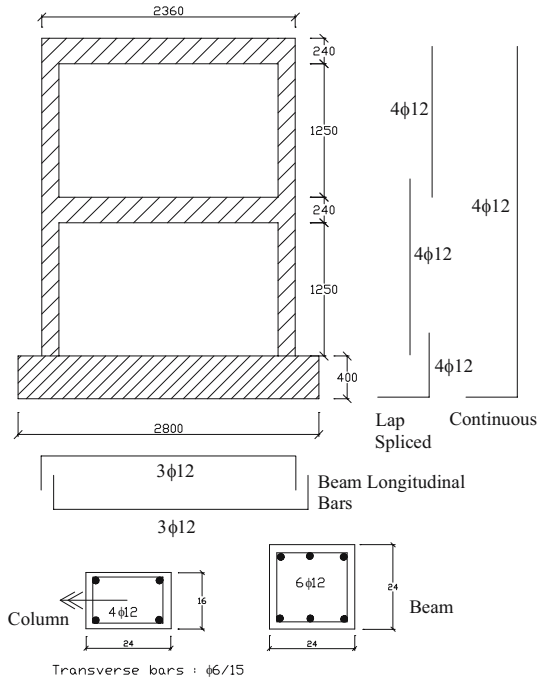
Dimensions and reinforcing details of the specimens (dimensions in mm)
